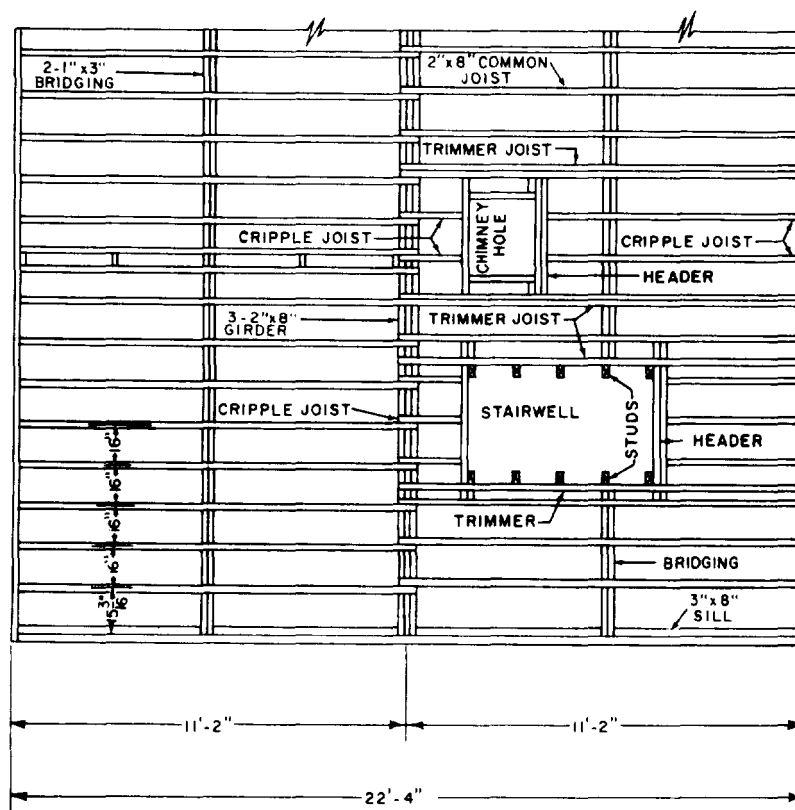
Example of a structural floor framing plan for a wood-frame construction.
